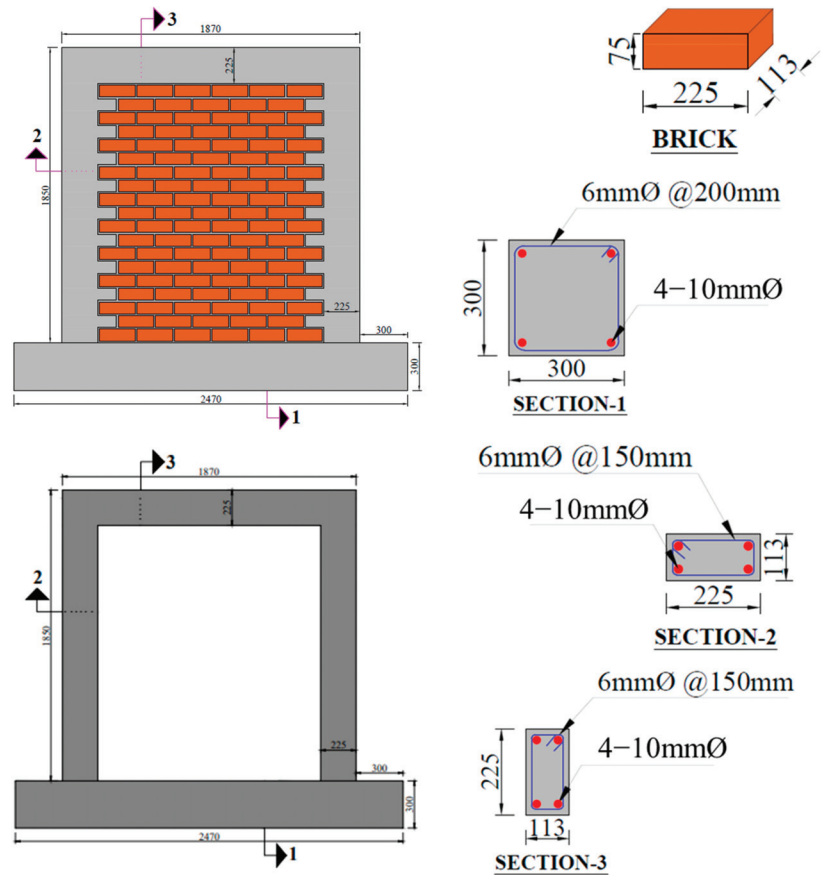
Schematics and reinforcement detailing of bare frame and confined masonry wall.
